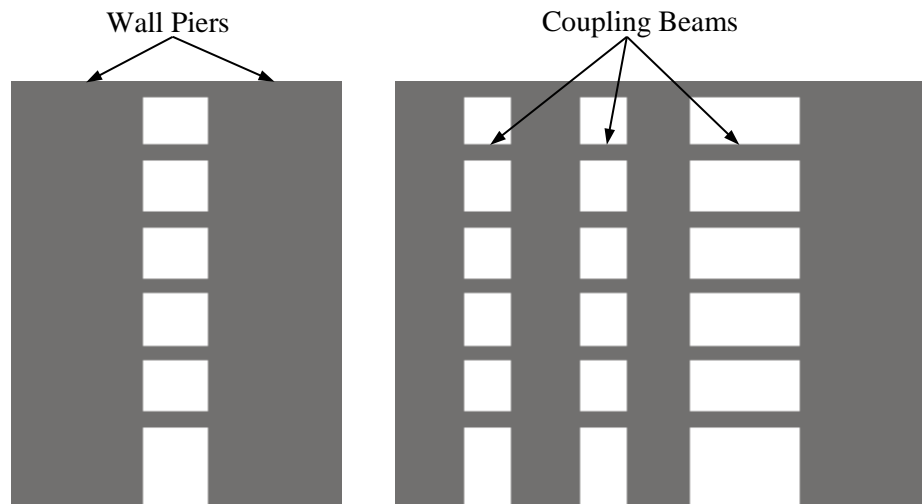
Examples of coupled wall geometry in conventional (residential and commercial) buildings (Harries et al., 2000).
